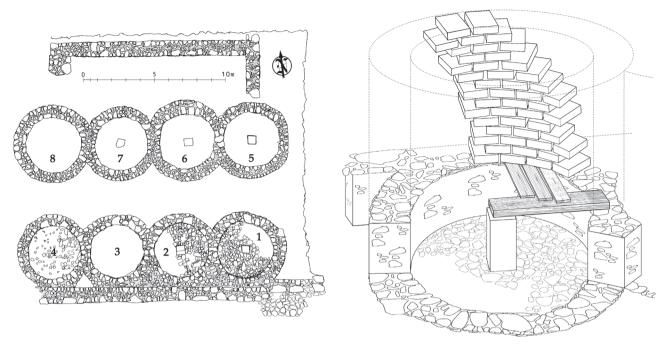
Mallia. Silo complex at the southwest corner of the palace, after Pelon 1980, plan 28.
